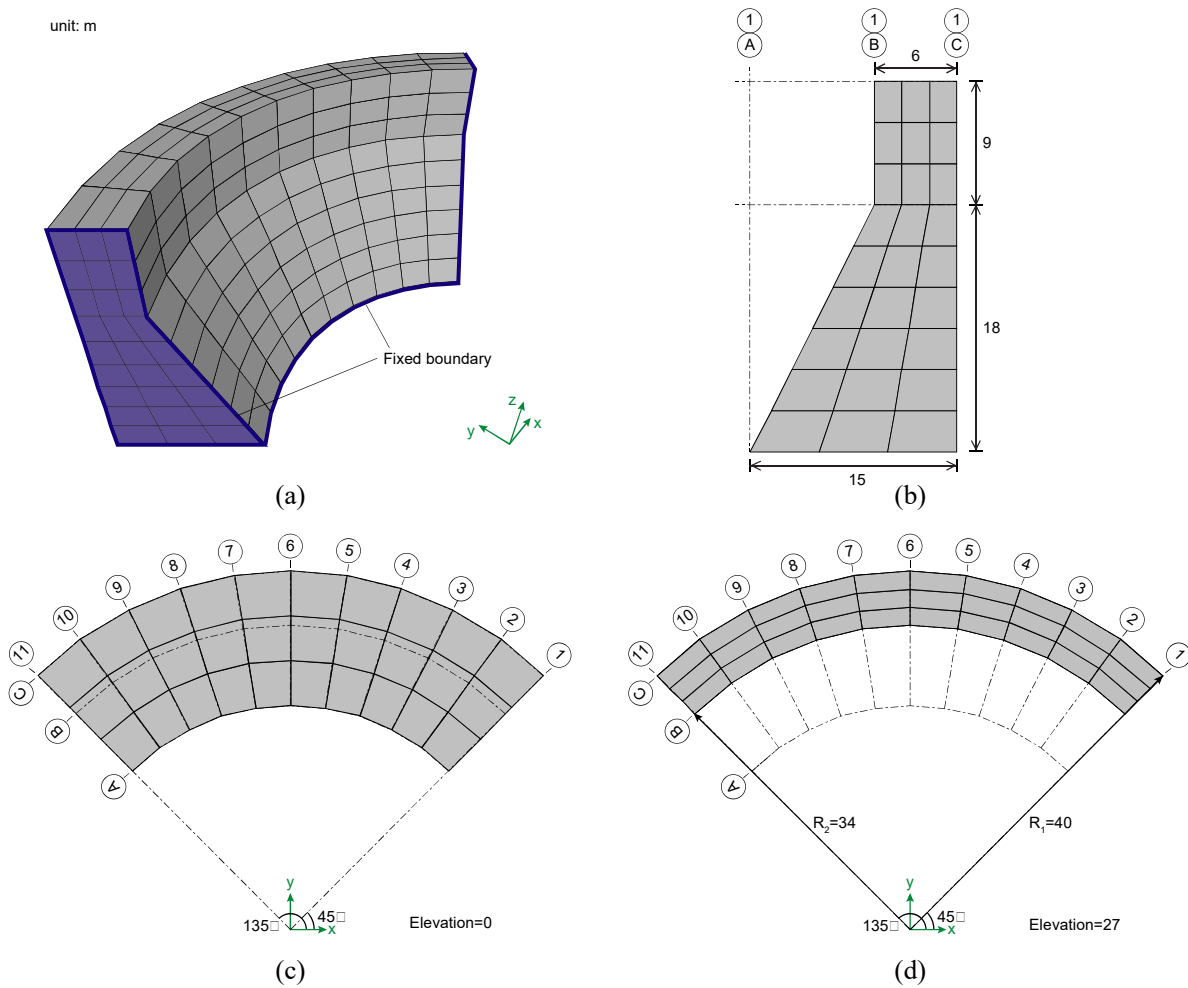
Dam structure problem: (a) problem domain definition, boundary conditions, (b) section view, (c) plan view at elevation 0 m, and (d) plan view at elevation 27 m.
